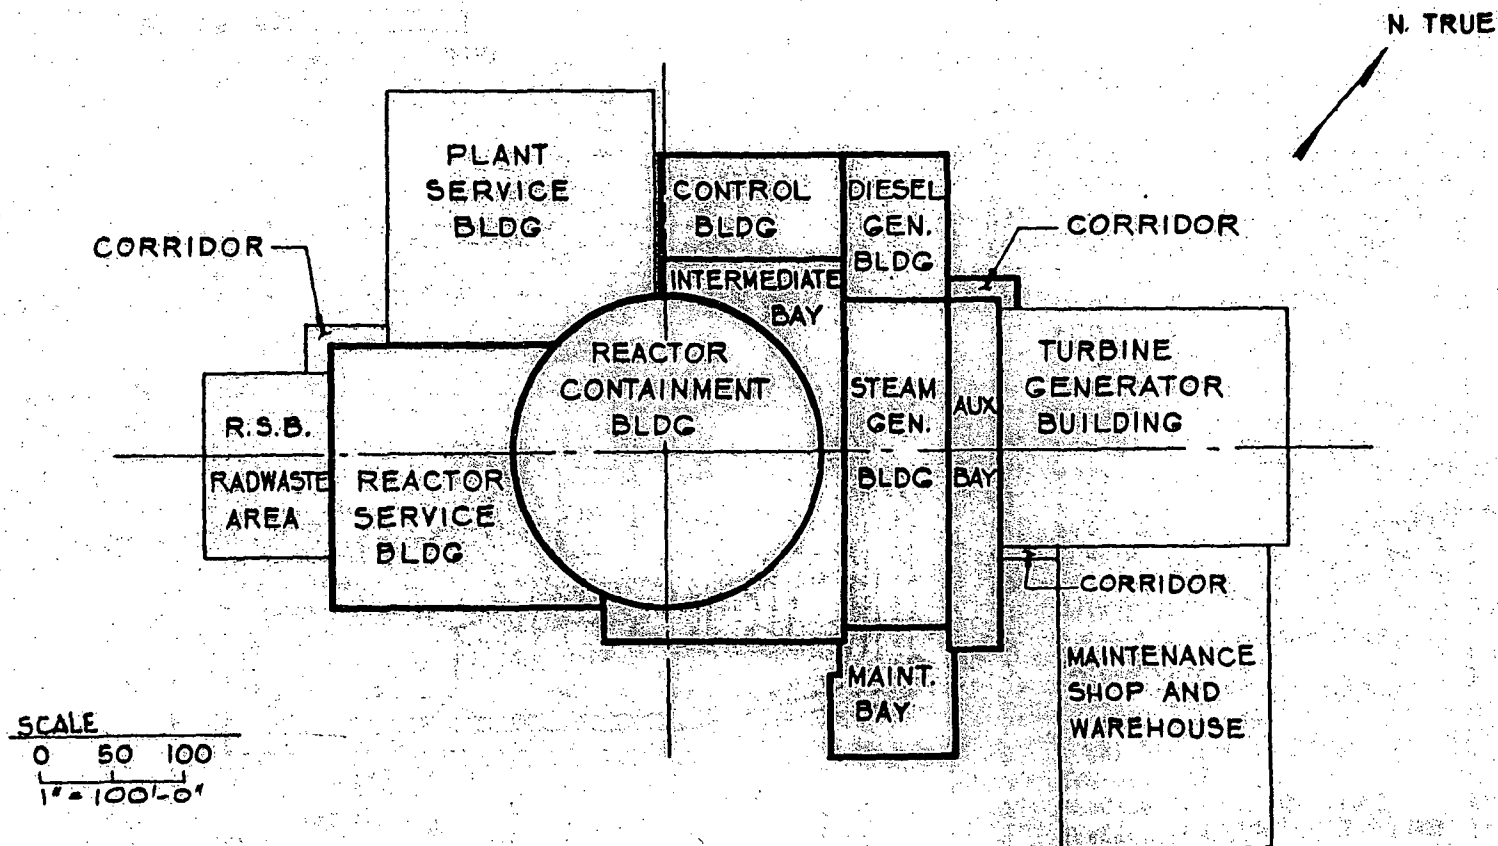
LAYOUT OF PLANT STRUCTURES IN RELATION TO THE SECURITY BARRIER
